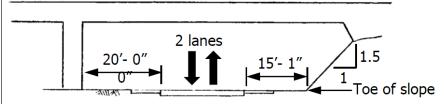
Bridge elevation view of horizontal clearances for a 2-lane highway feature with 2-way traffic below the bridge.
